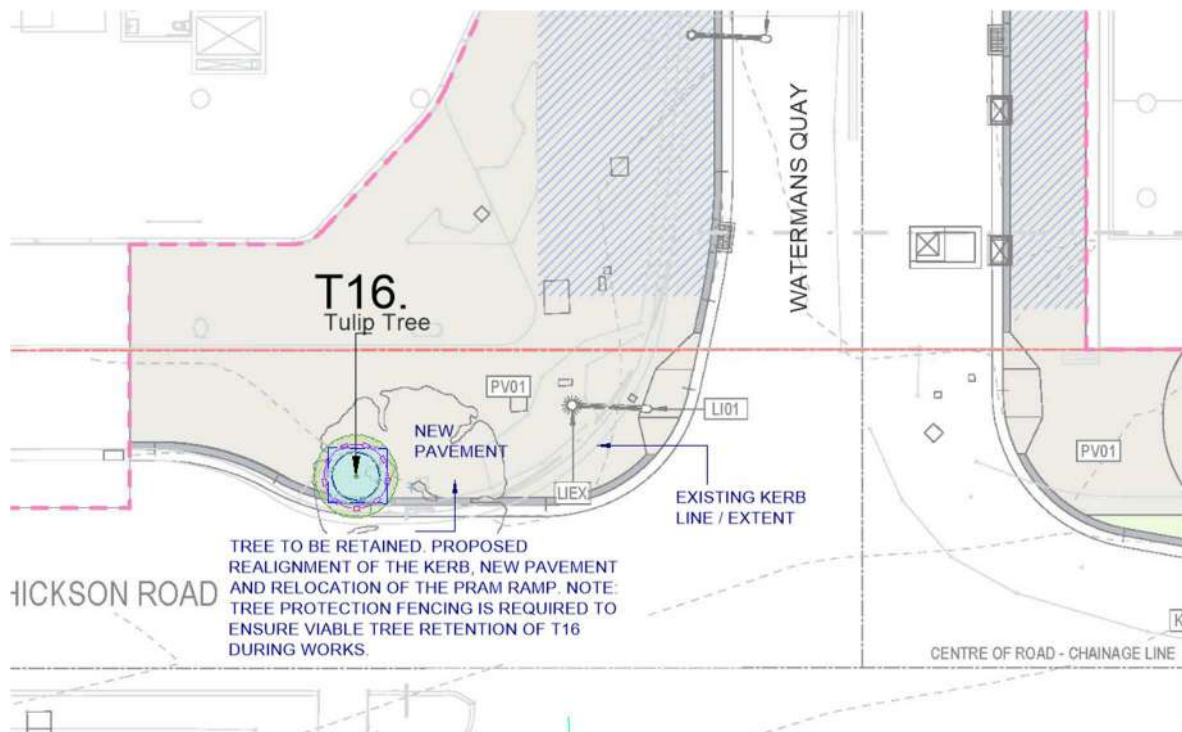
A portion of the proposal plan with the Arborist Impact Plan over and survey below showing the proposed pram ramp and alignment of the existing kerb, and extent of new pavement around T16 around Watermans Quay.
